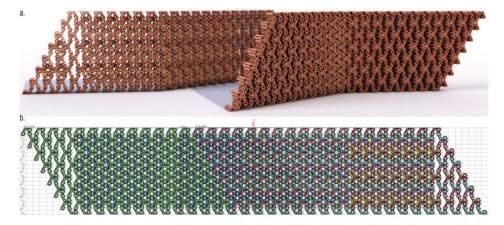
Top: Artistic rendering of our wall design. The two walls face each other, and are L-shaped to increase their stability.
